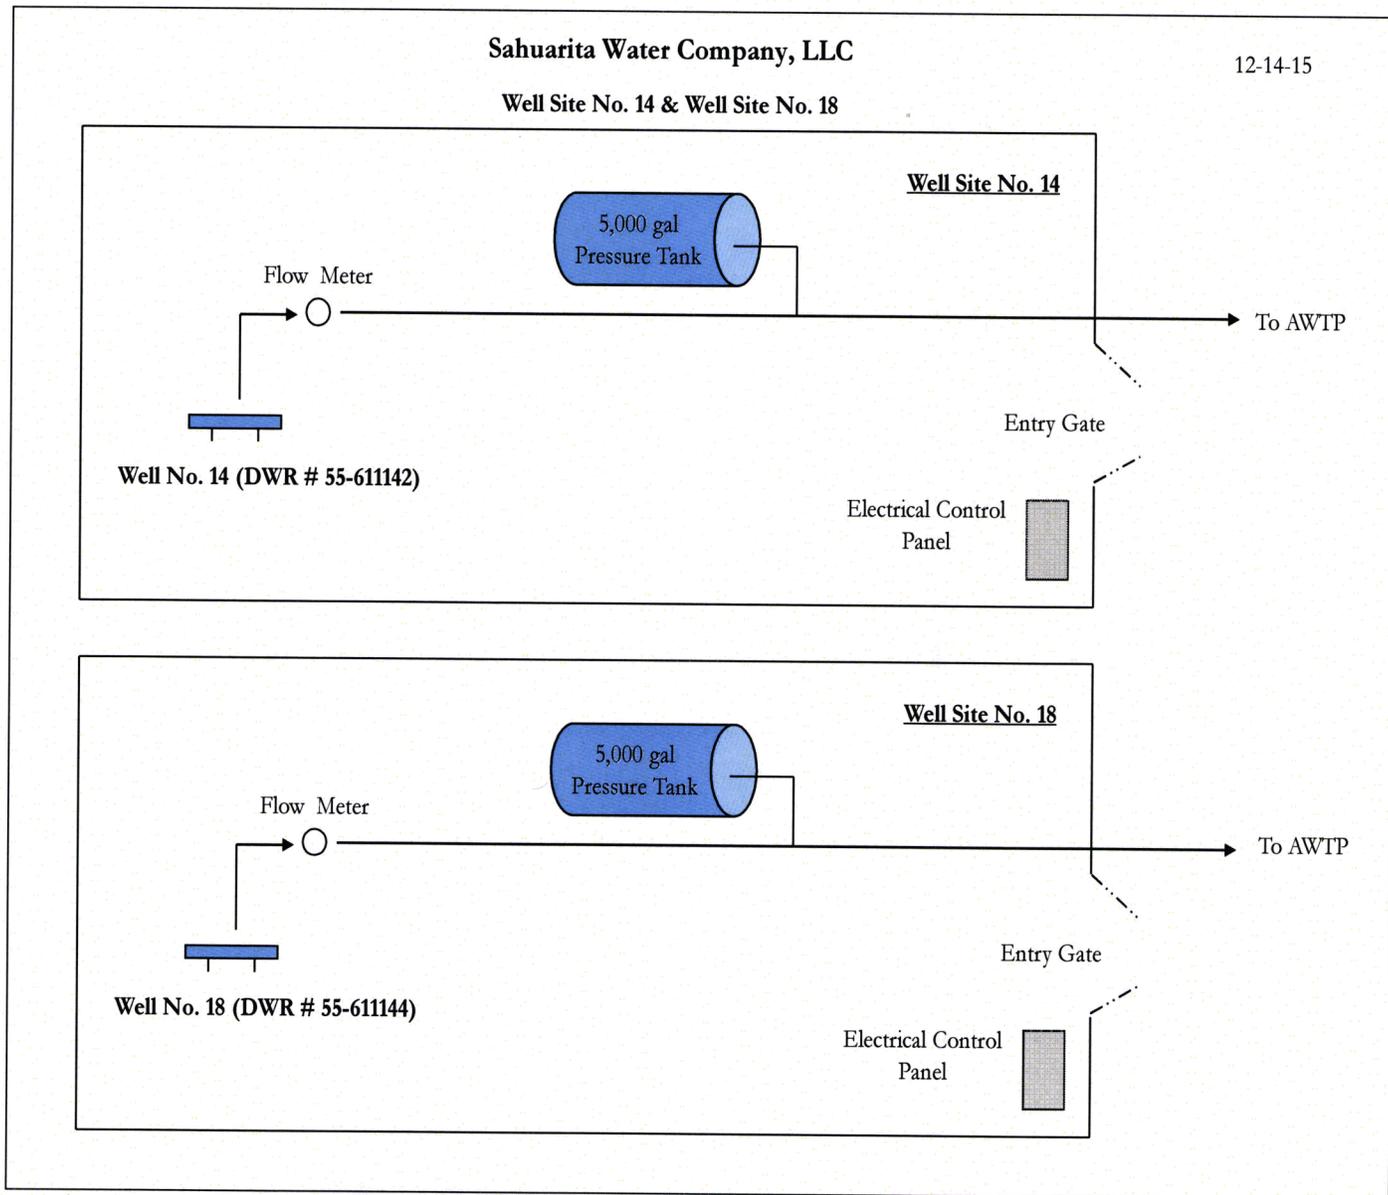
WELL SITE NO. 14 AND WELL SITE NO. 18
